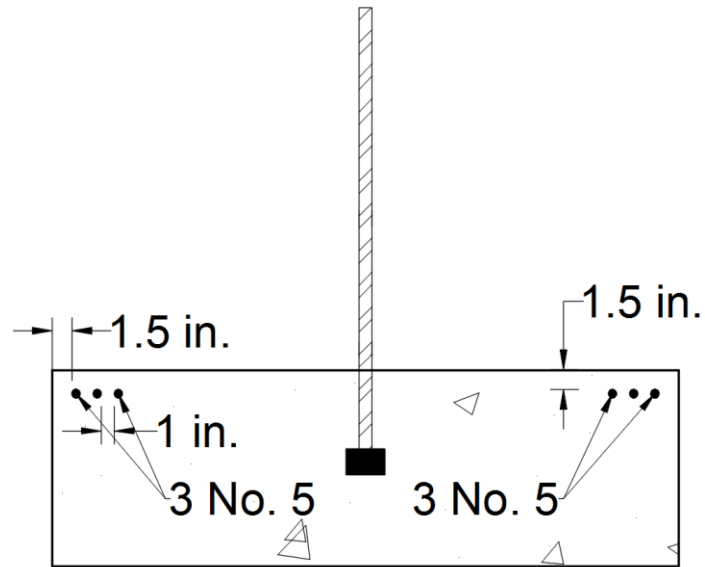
End view of shallow embedment specimen with 6 No. 5 bars as flexural reinforcement.
